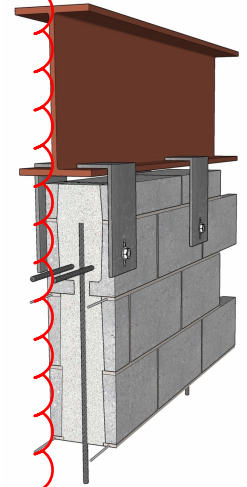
Hybrid Design of a shear wall and top-of-wall bond beam
